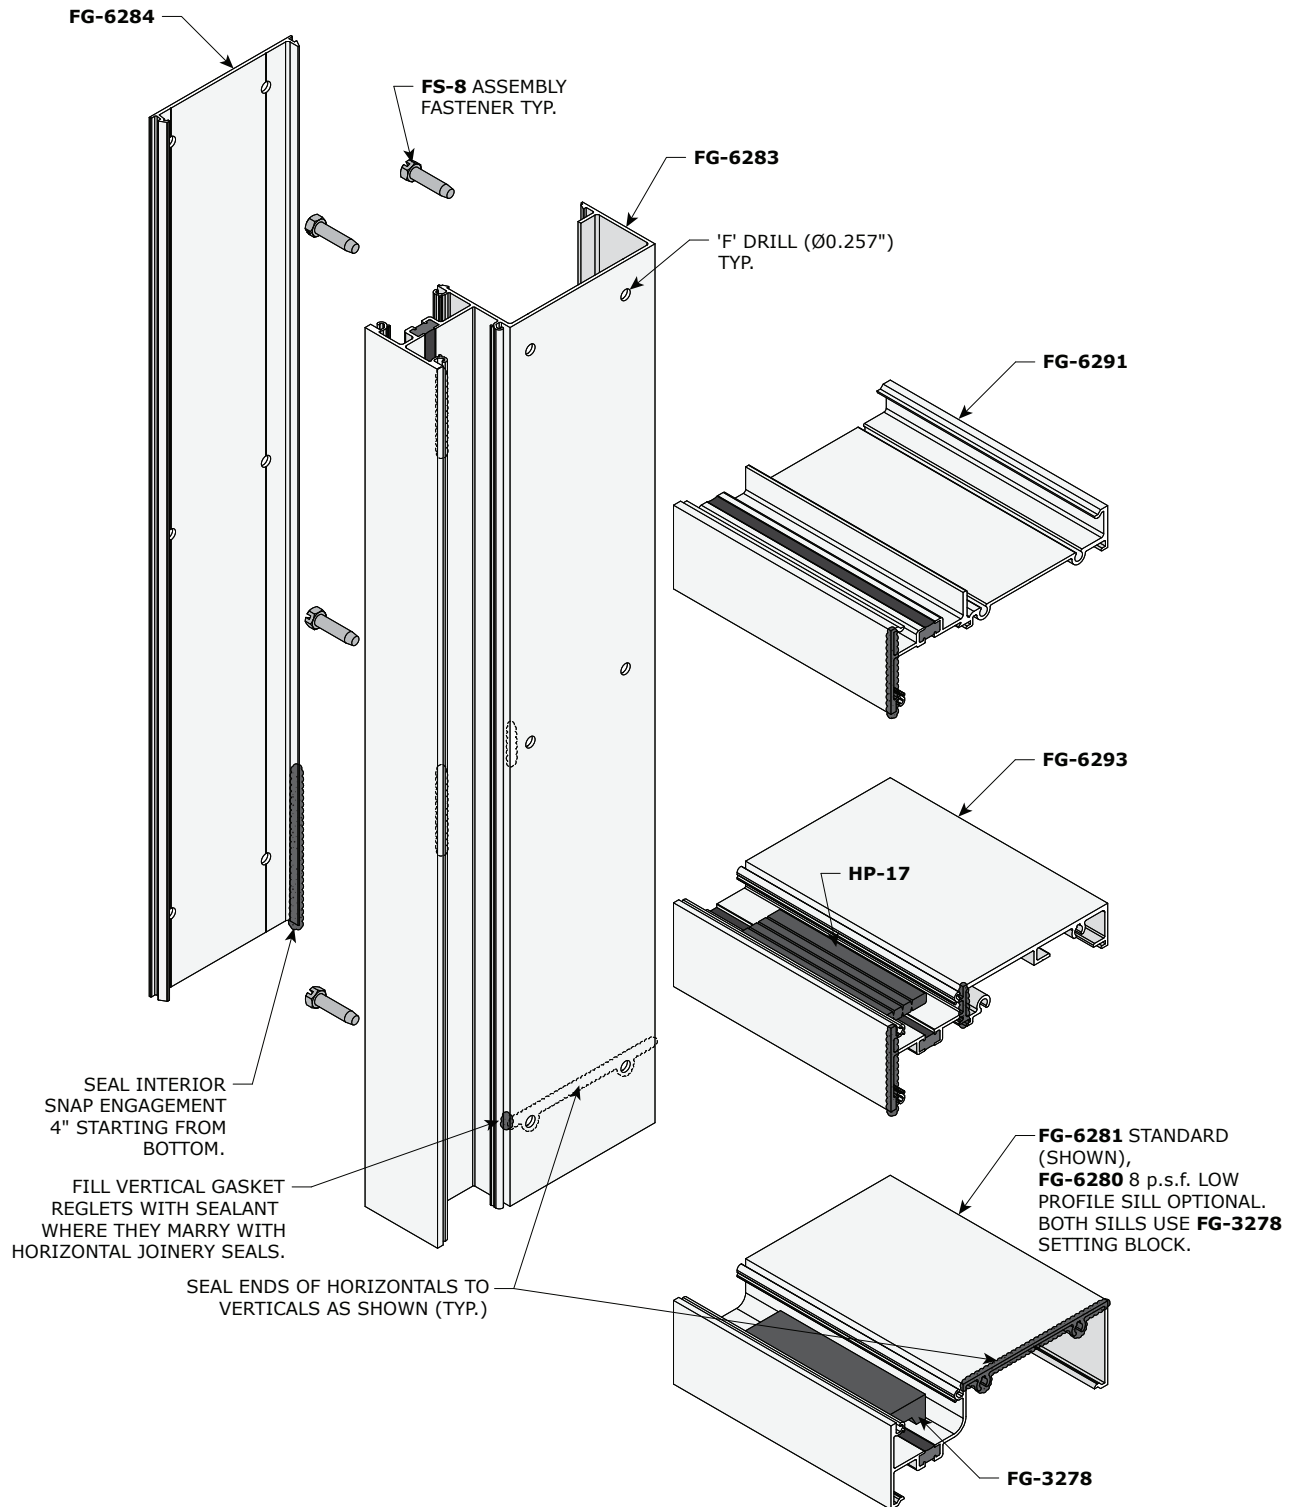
Frame Assembly - Front Set, Inside Glazed, Screw Spline System
